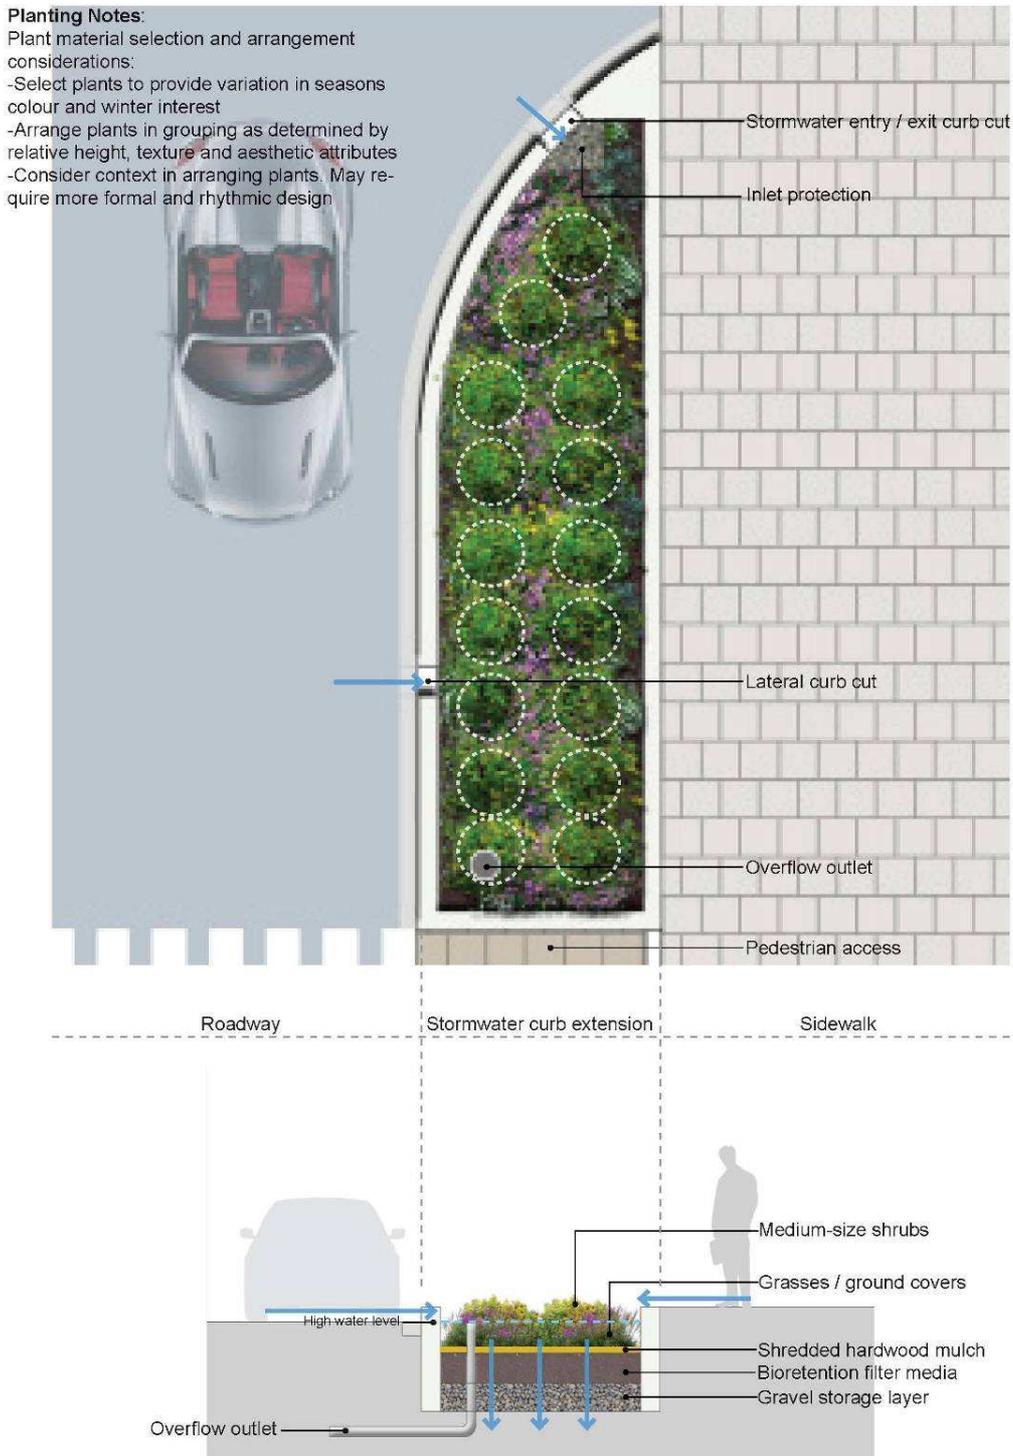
Vegetated curb extensions plan view and cross-section; sizing and layout guidance is provided in the LID Stormwater Management Planning and Design Guide.
